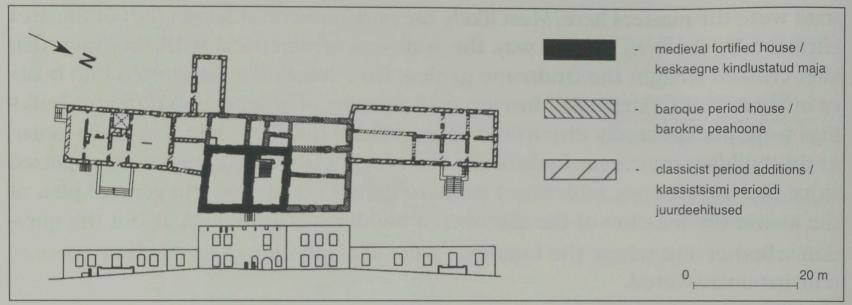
Plan of the ground floor and east façade view of Kiltsi manor house. In 6. Kiltsi mõisahoone peakorruse plaan ja idafassaadi vaade.
